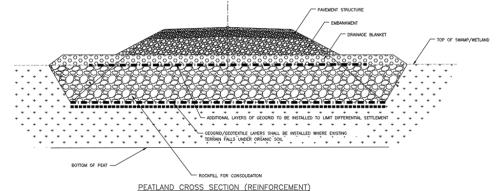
Proposed cross section of floating road structure using reinforcement technique
